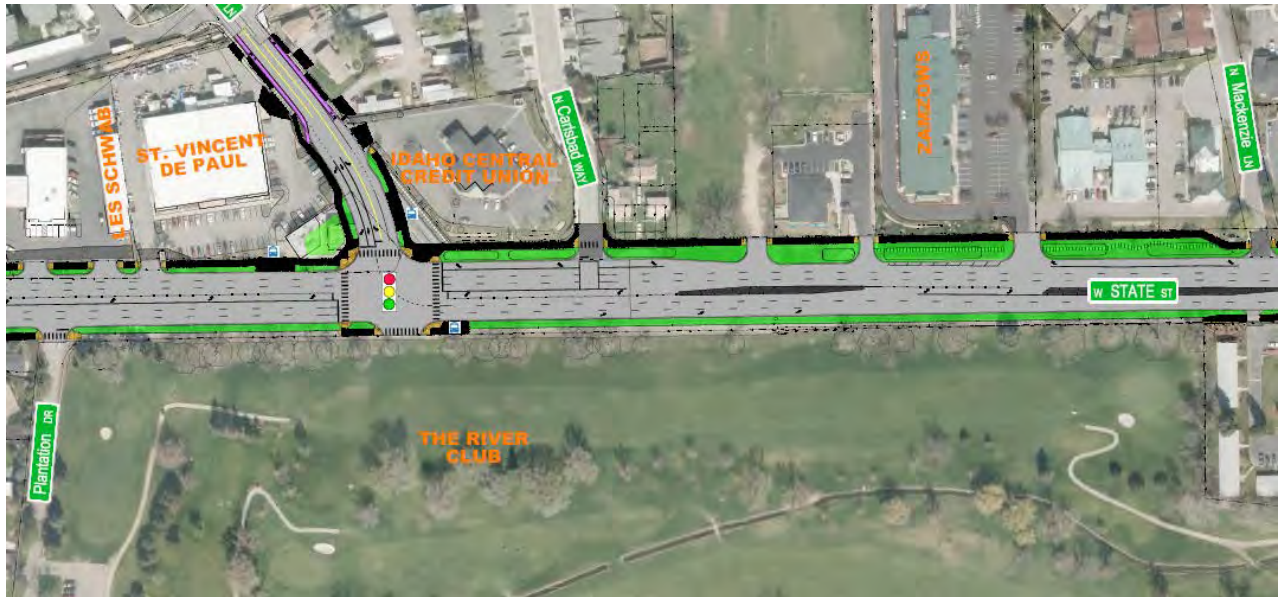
ACHD State Street / Pierce Park Concept Design with Proposed Site Accesses Noted
